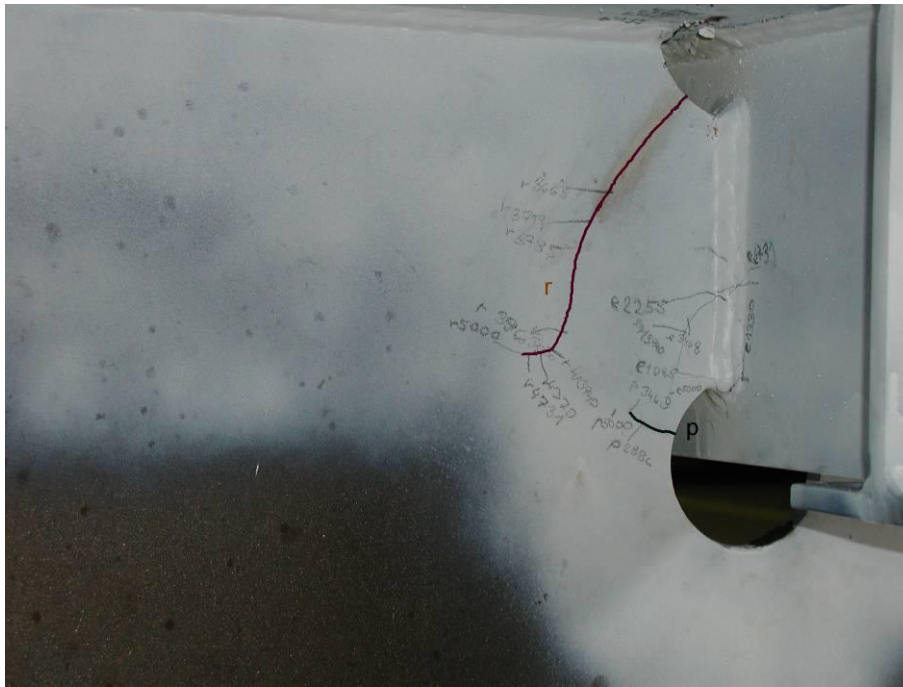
Fatigue cracks in specimen A3.
